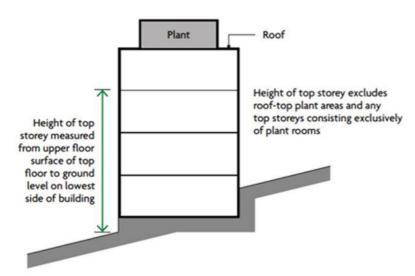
Diagram for how to measure the height of a building for planning gateway one.
